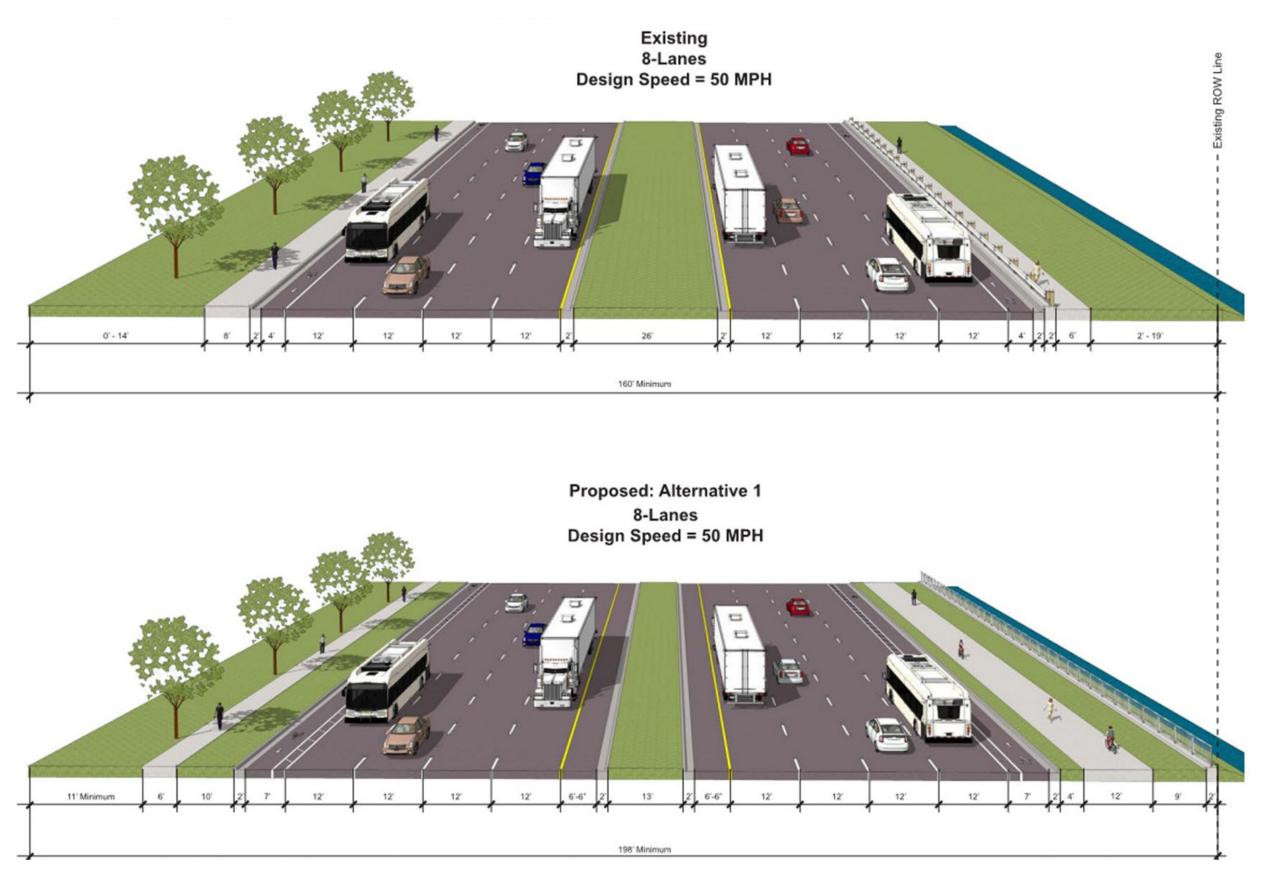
| Alternative | Typical Section Concept vs Existing Typical Section
